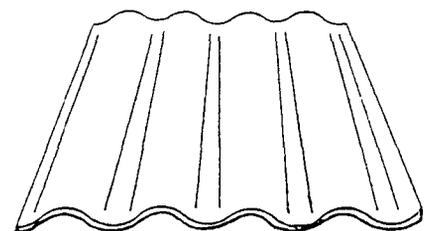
TRADITIONAL CORRUGATED SHEET METAL
